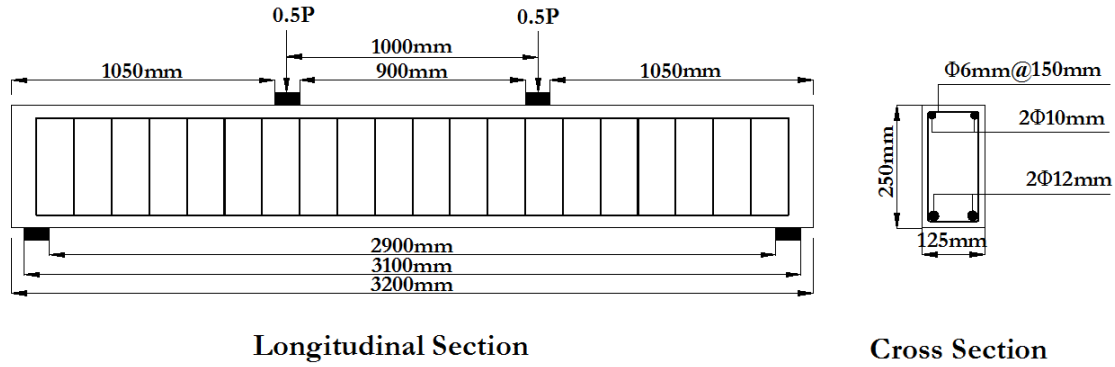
Description of Flexure Control Beam Model, [Balamuralikrishnan et al., 2009]
